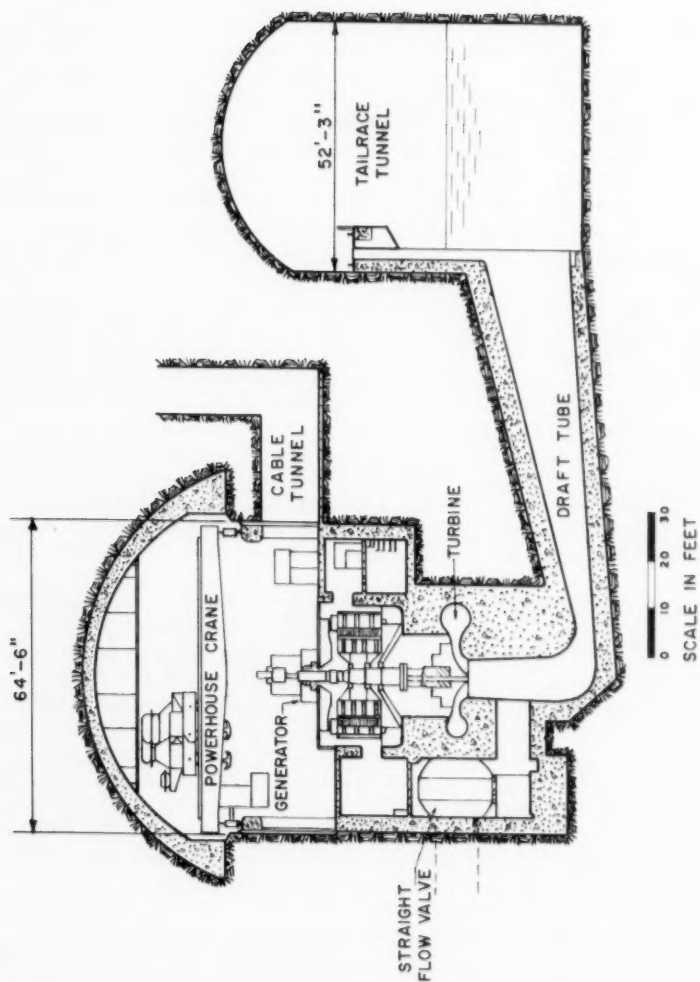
CROSS SECTION OF BERSIMIS No. 1 POWERHOUSE AND TAILRACE TUNNEL
